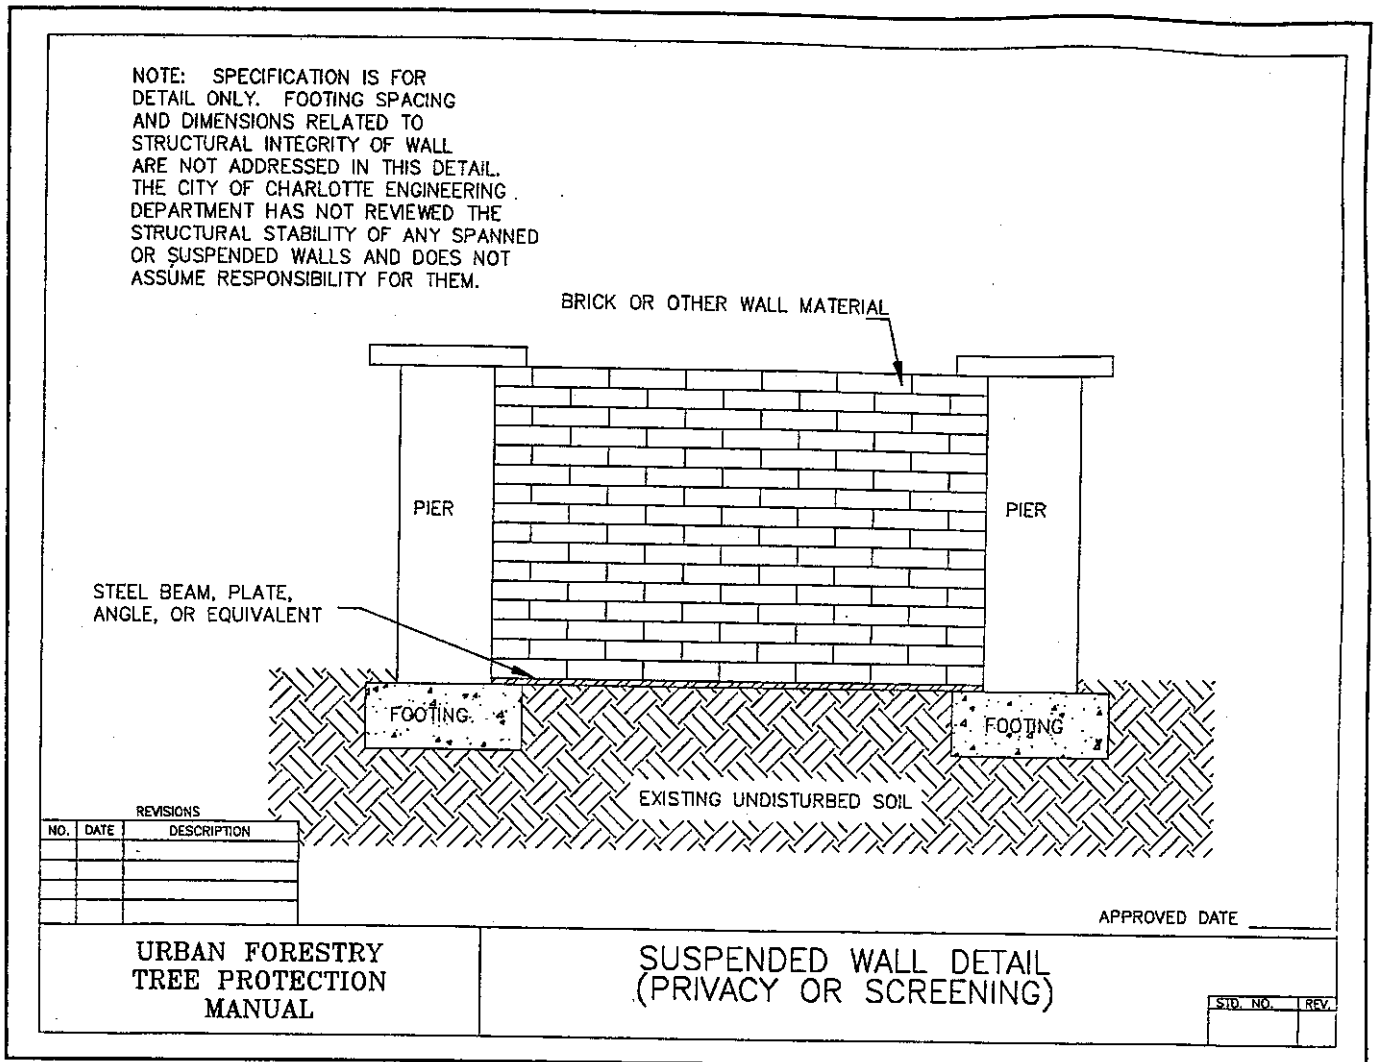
Detail of a wall suspended between piers. (Detail provided by Mary Ann Beale, City of Charlotte, North Carolina.)
